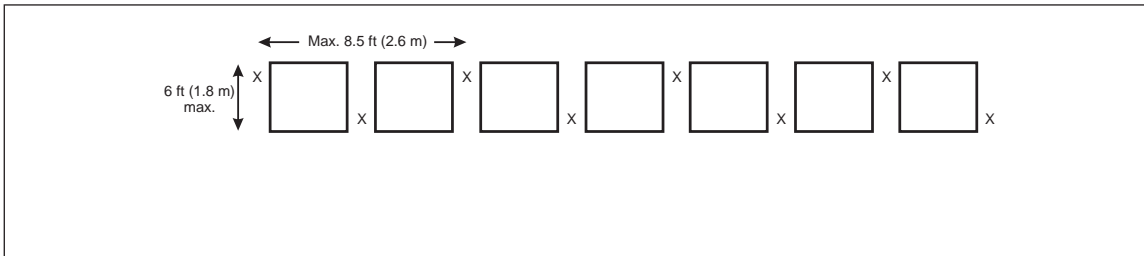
Plan view of alternative in-rack sprinkler arrangement for single-row racks up to 6 ft (1.8 m) deep
